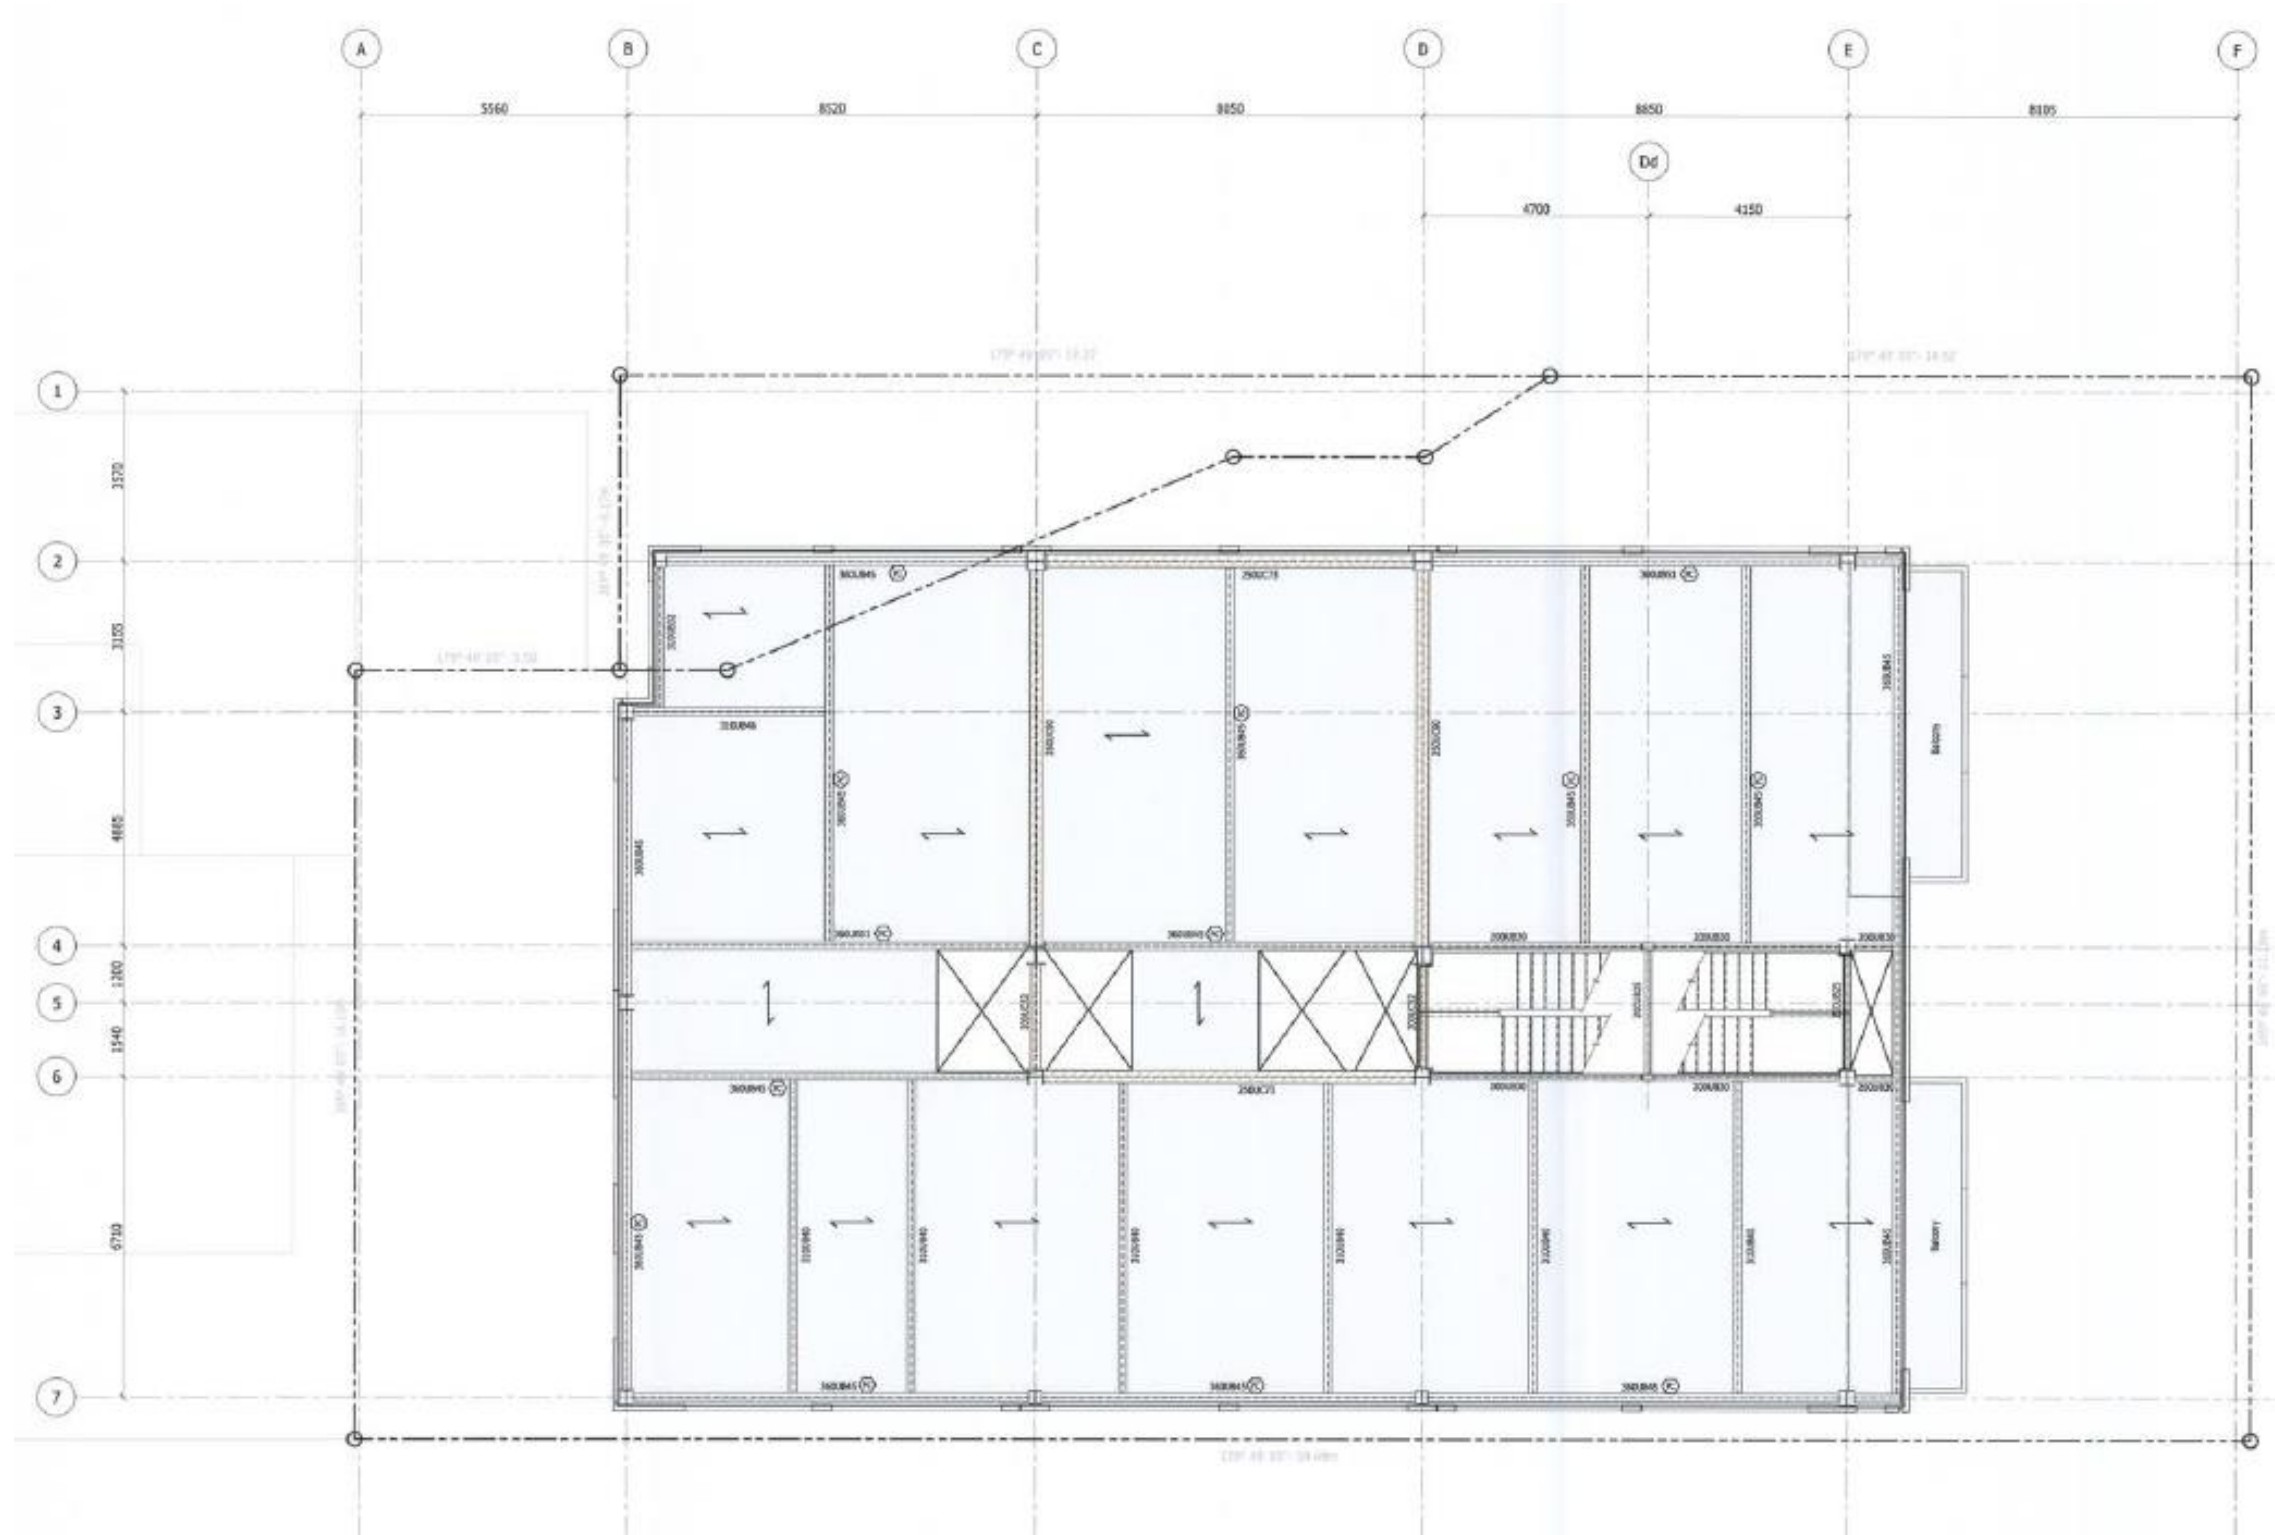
Structural Plan Level 16 (Christchurch City Council 2016c)
